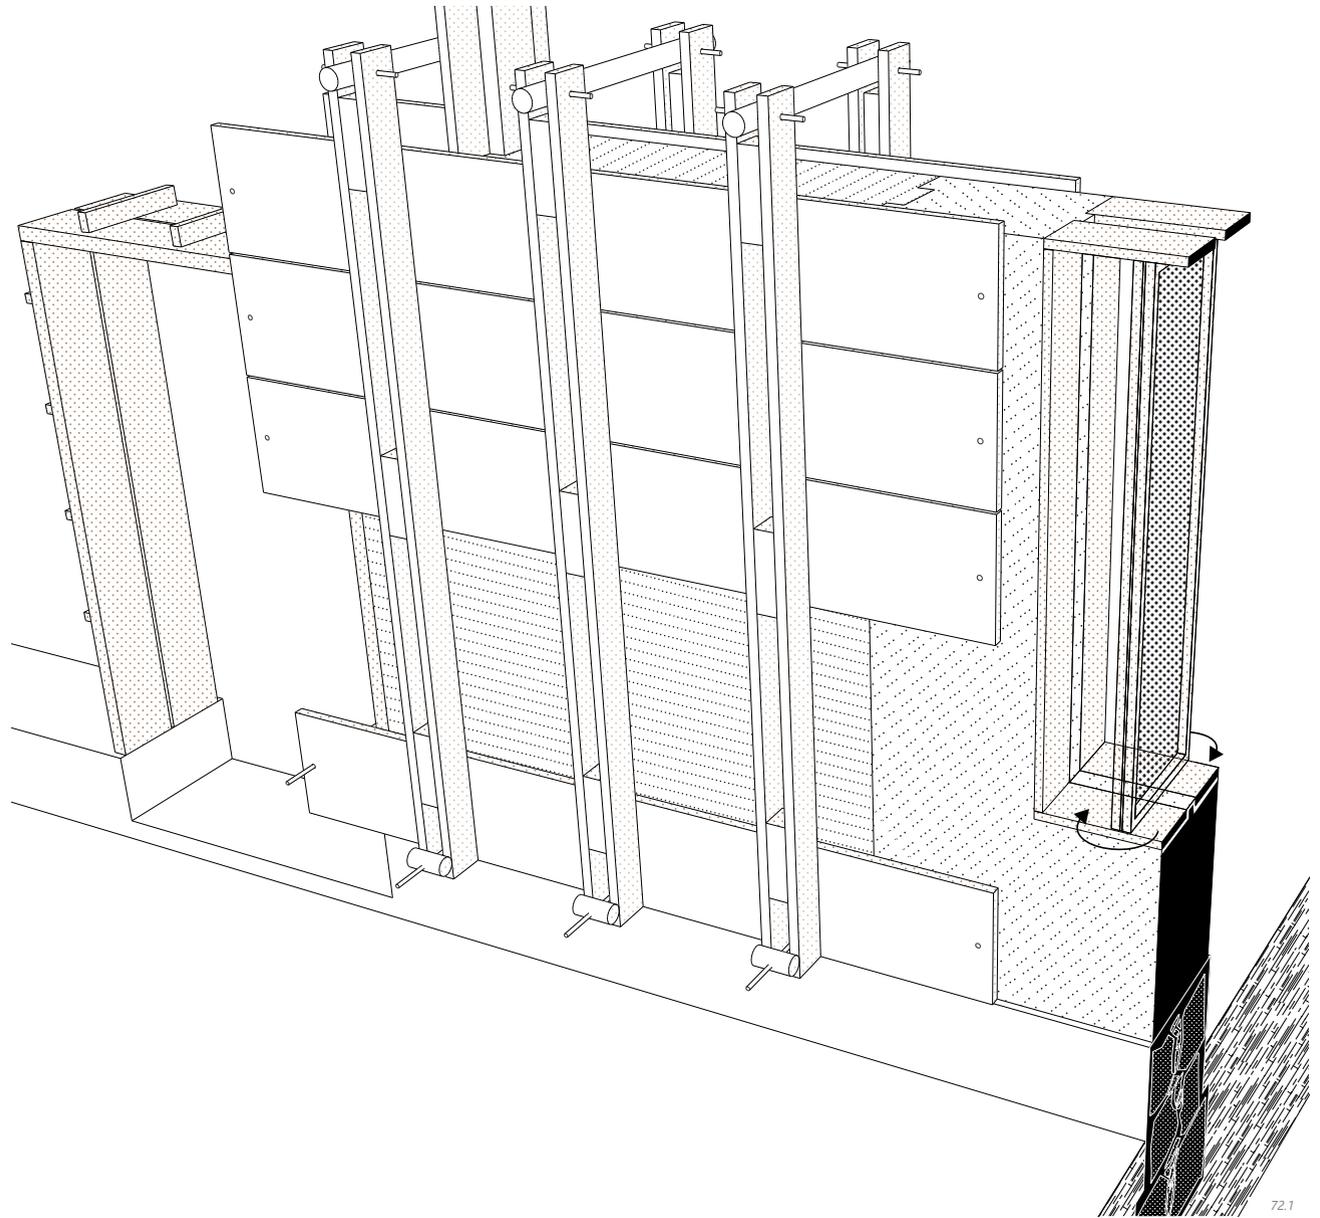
| 3d-drawing of the formwork system – showing how to use window- and door frames as permanent shuttering and how to install the formwork – three frames – three frames are used to hold the shuttering boards together
